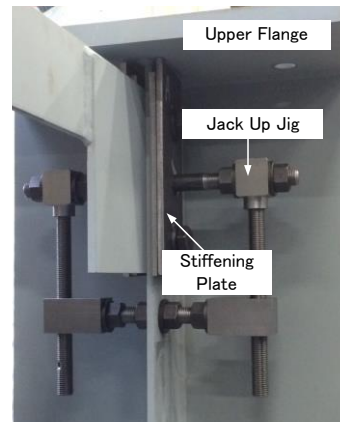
Stiffening Plate Retrofitting Method Using a Jack-up Jig
